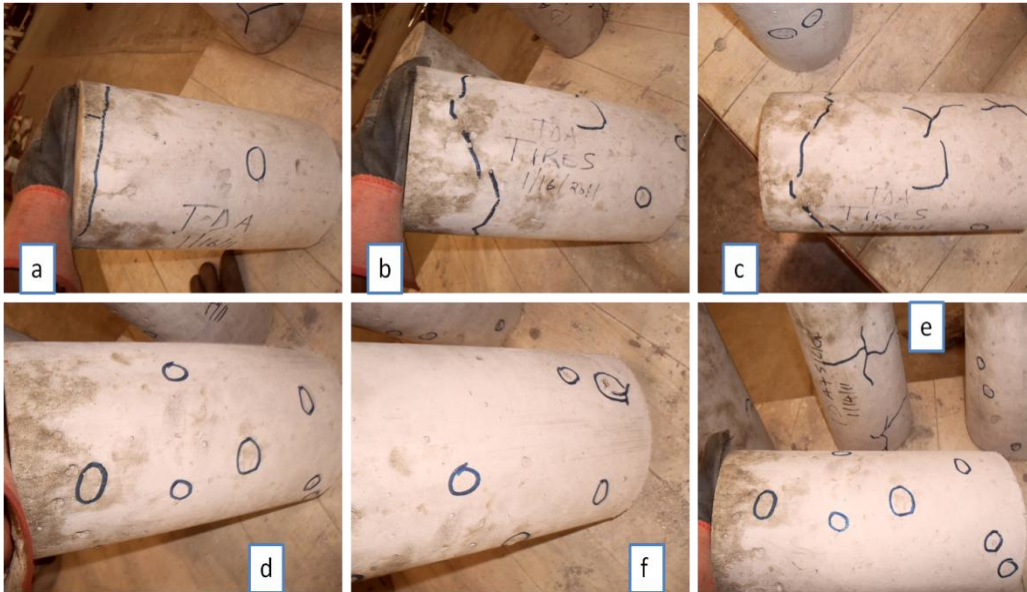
Cracks and spalling on TDA Concrete after exposure to 100°C for 3 hrs in the oven.
